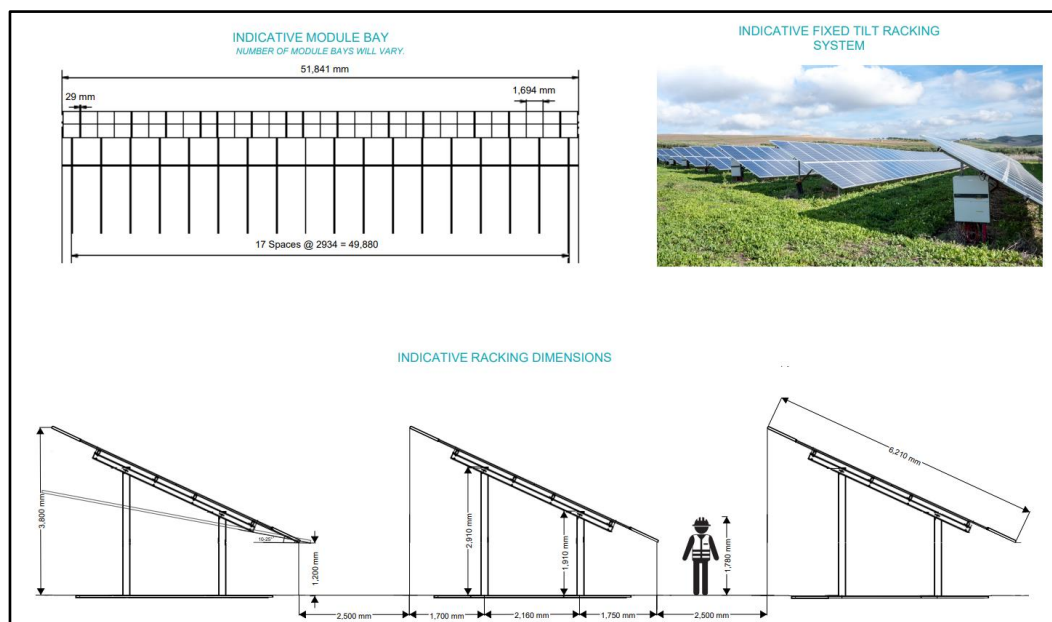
Fixed tilt structural details (Source: Beca Civil Drawings).
